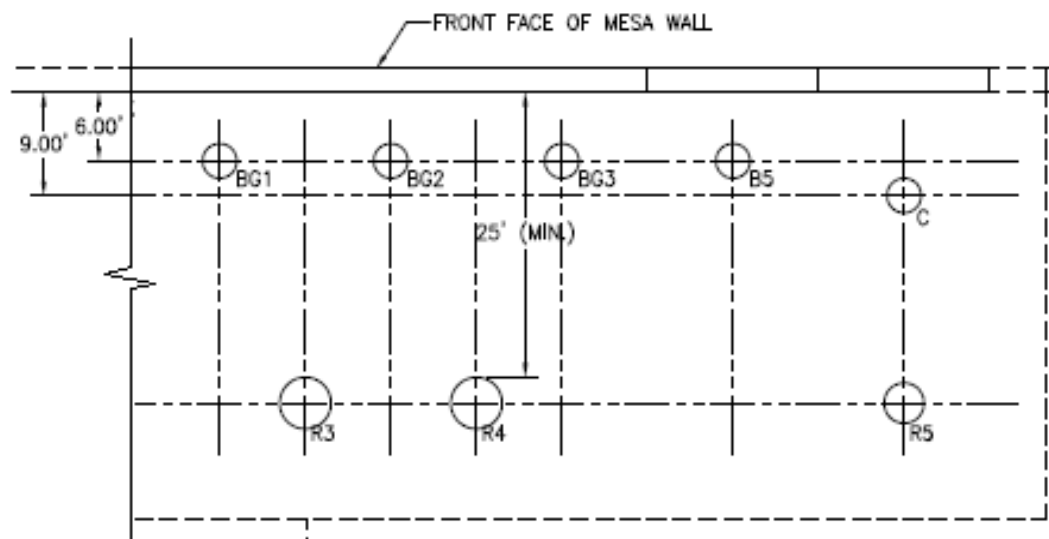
Plan view of MSE test wall and shafts (Tensar 2007)
